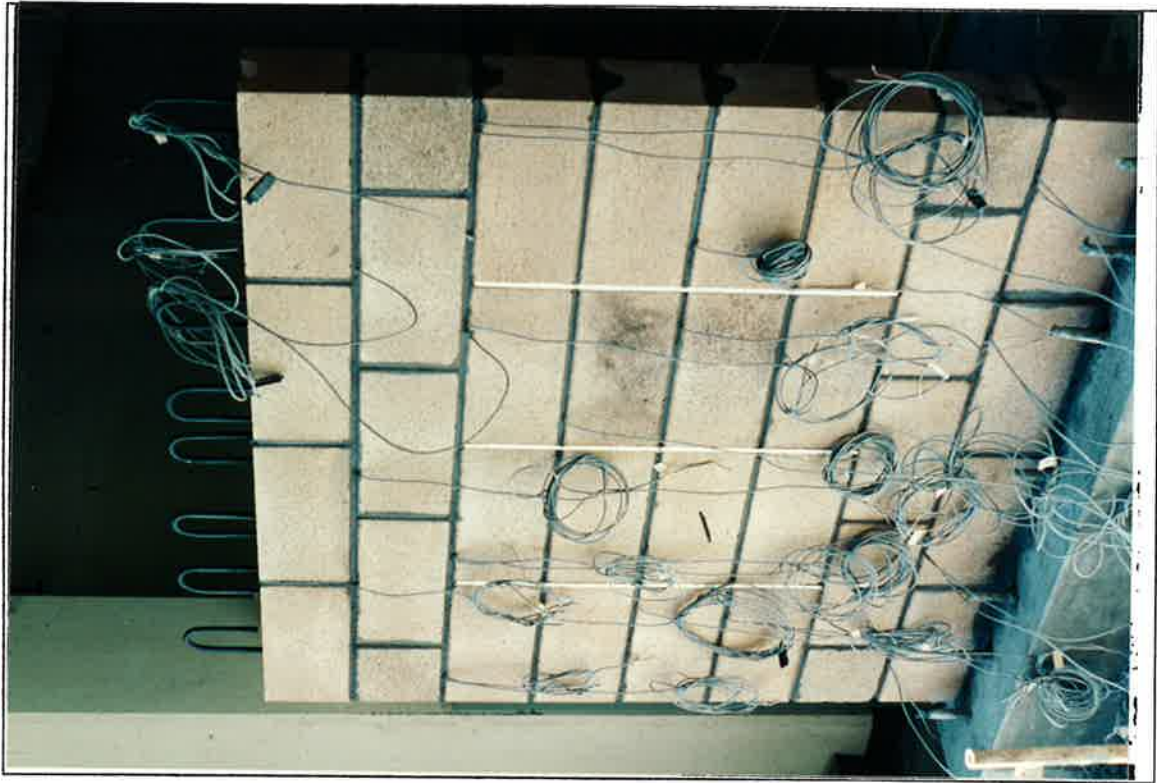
Final Stacking Arrangement of Slitted Wall Blocks
